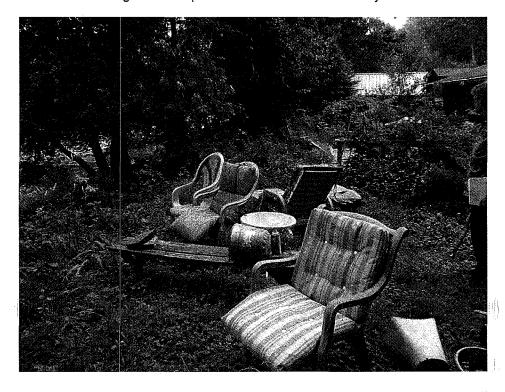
Crest and riverward slope of levee (looking east near Station 64+50)
